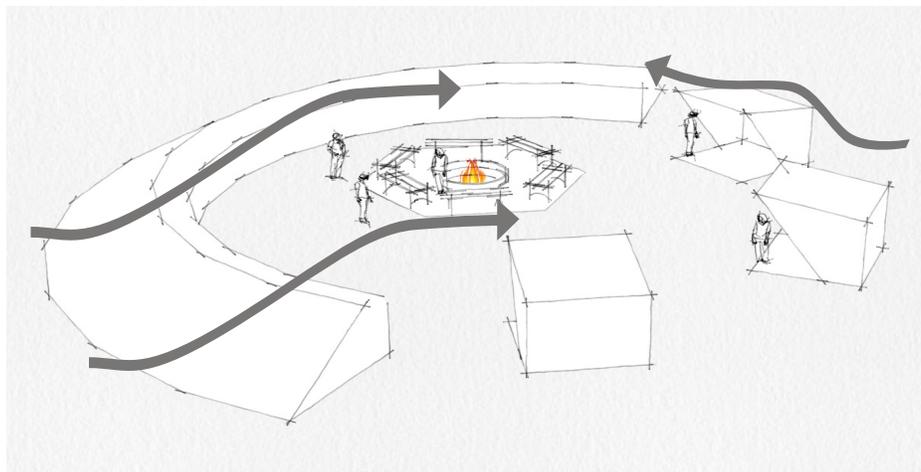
Using a landscaped berm and buildings positioned to protect from wind conditions and create a comfortable outdoor gathering area.
